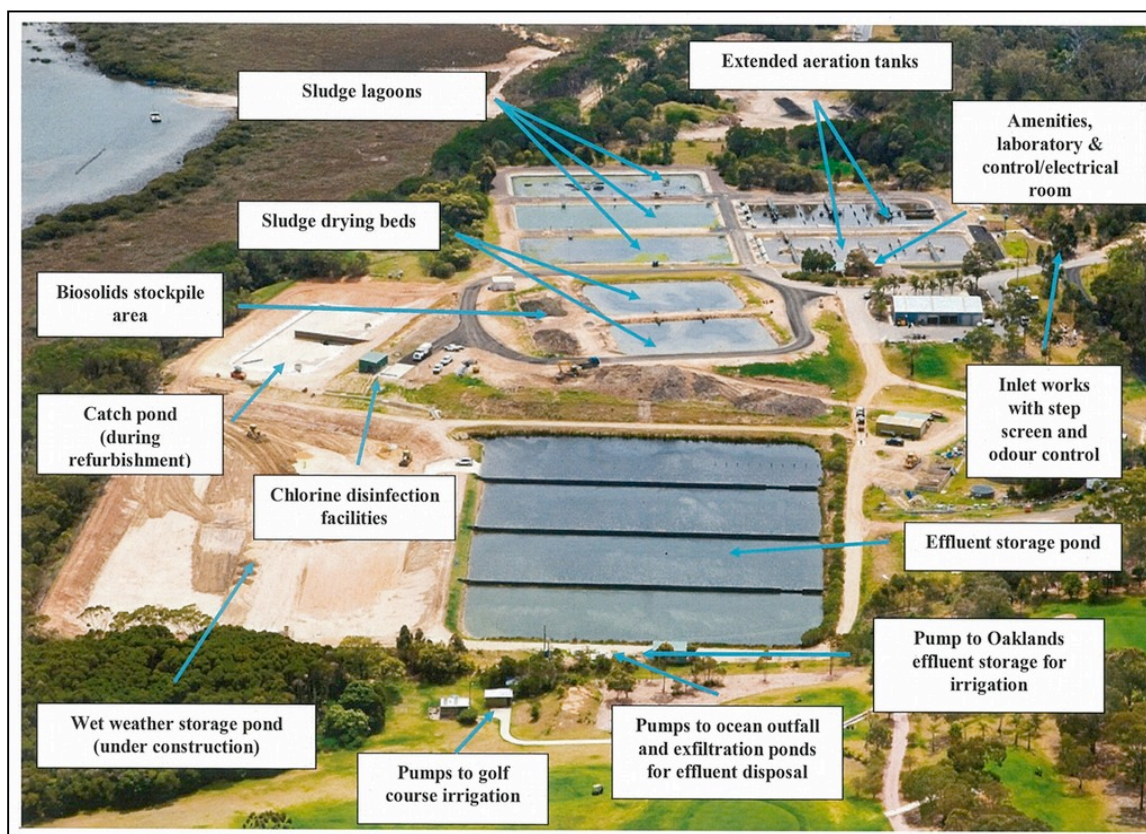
Aerial showing existing STP site layout (Source: Bega Valley Shire Council)
